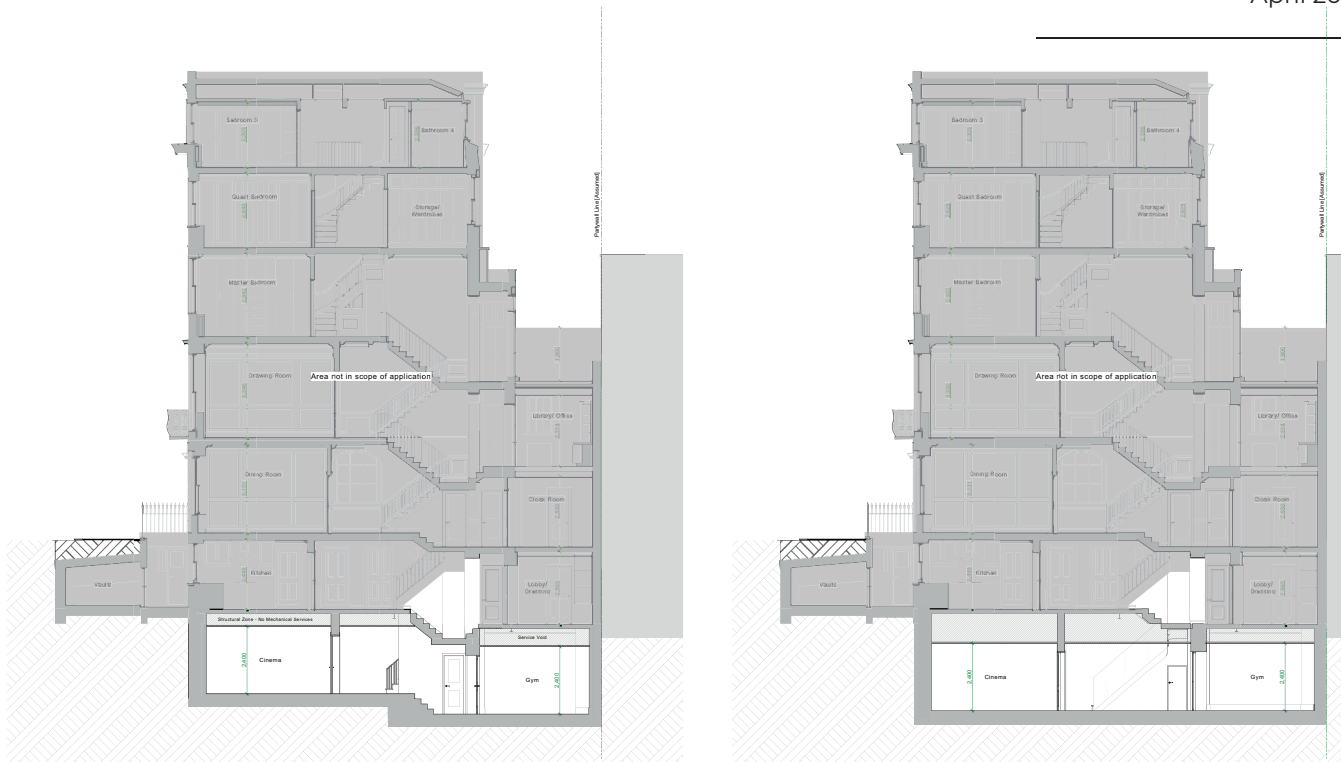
Approved (left hand side) and proposed (right hand side) section
